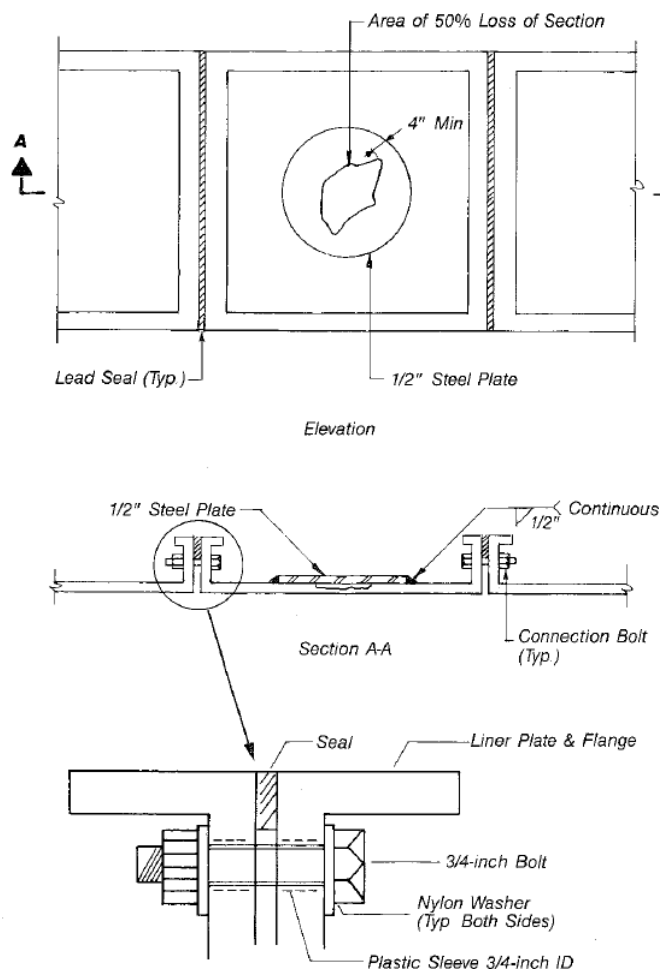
Steel Segmental Liner Repair (Russell, 2000)
